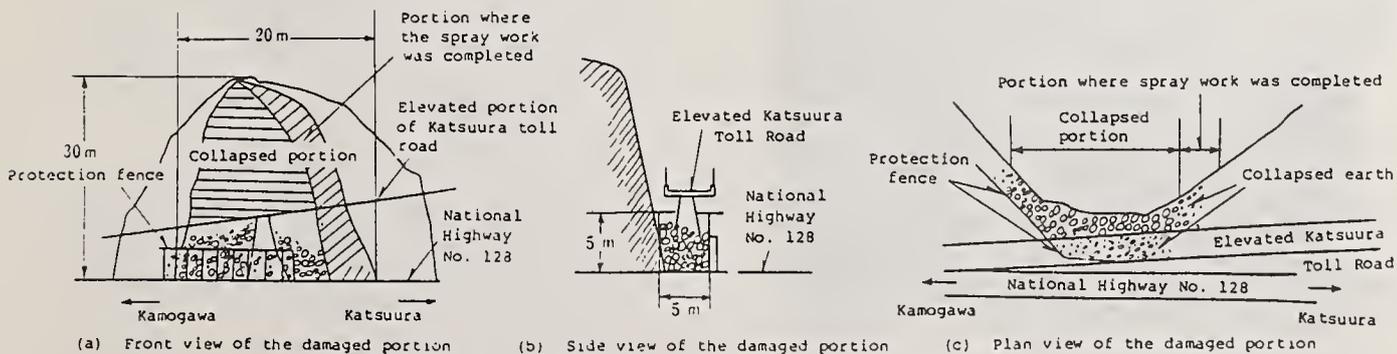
Damage to the National Highway No. 128 (Katsuura City)
